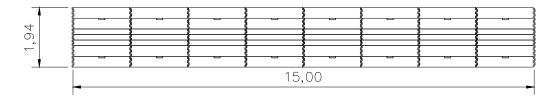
Wooden planking: the largest planks are on each sides, joined at their midspan by mortise and tenon.
